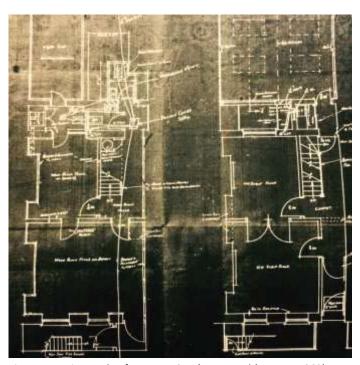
Drainage plan for no. 75 Gray's Inn Road (January 1969)
